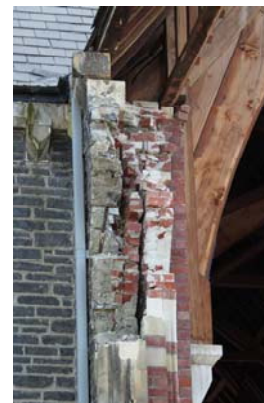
Representative examples of wall cross-sections for Christchurch stone masonry buildings
